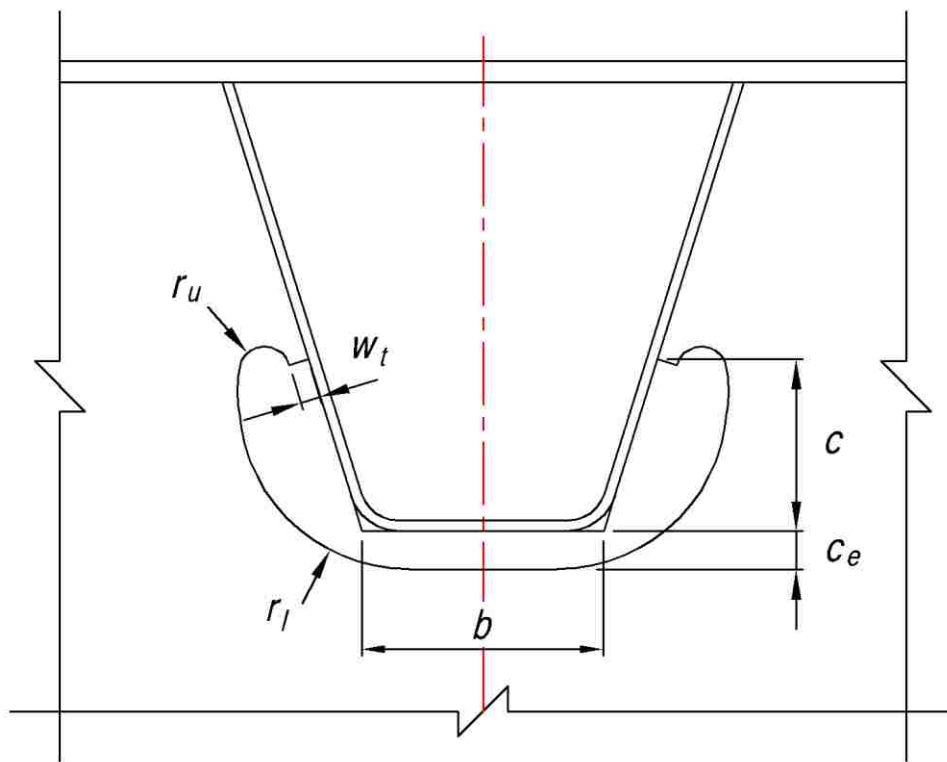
Parameters of the extended cutout in the rib-to-floor beam connection with trapezoidal rib profile
